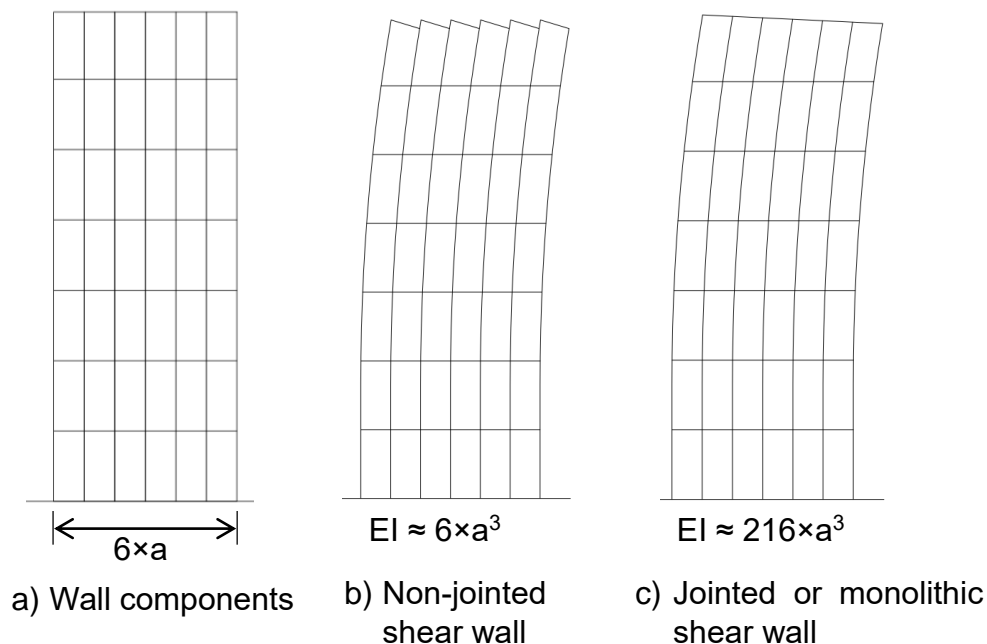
SHEAR WALL BEHAVIOUR DUE TO CONNECTIONS
